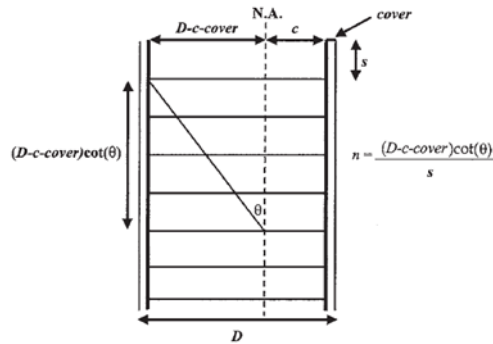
Effect of concrete compression zone on truss mechanism, Kowalsky and Priestley (2000)
